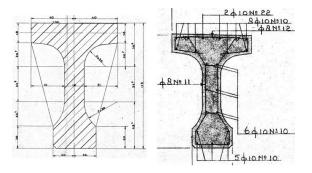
Cross-section of girder (left) and steel reinforcement (right) (measurements in cm).
